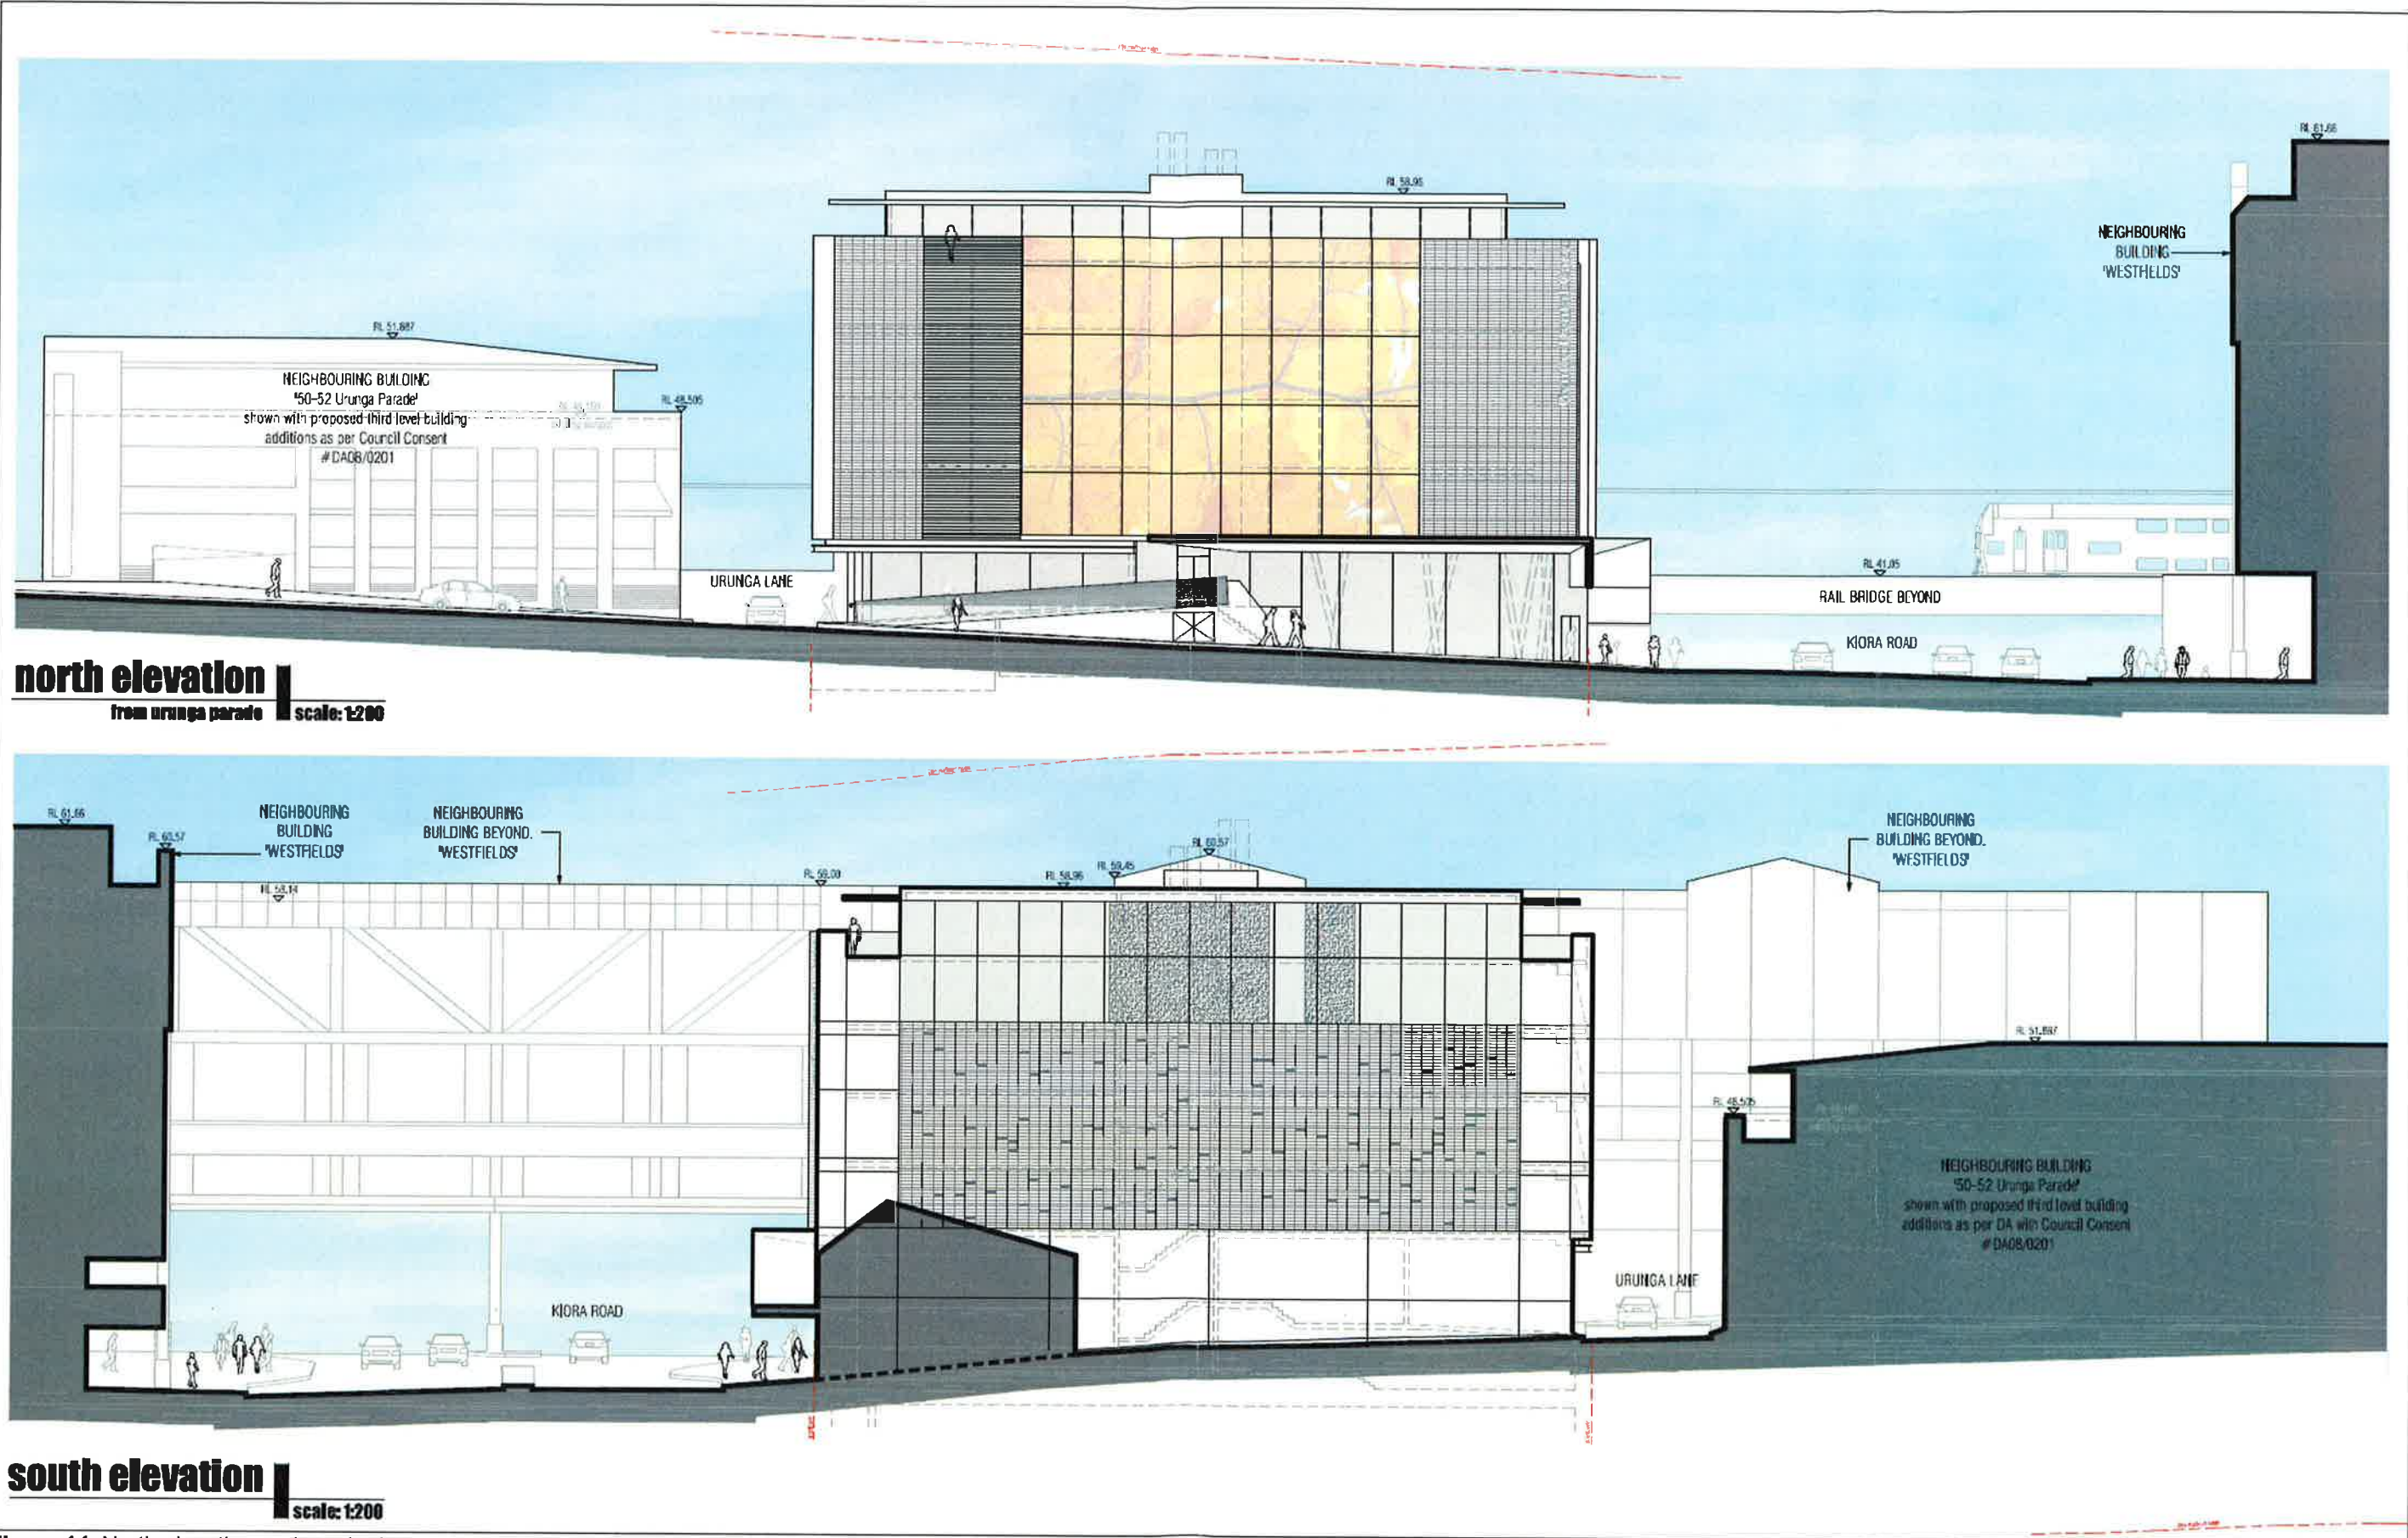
North elevation and south elevation showing mass, scale and height of proposal in context of locality (Source: PPR)
